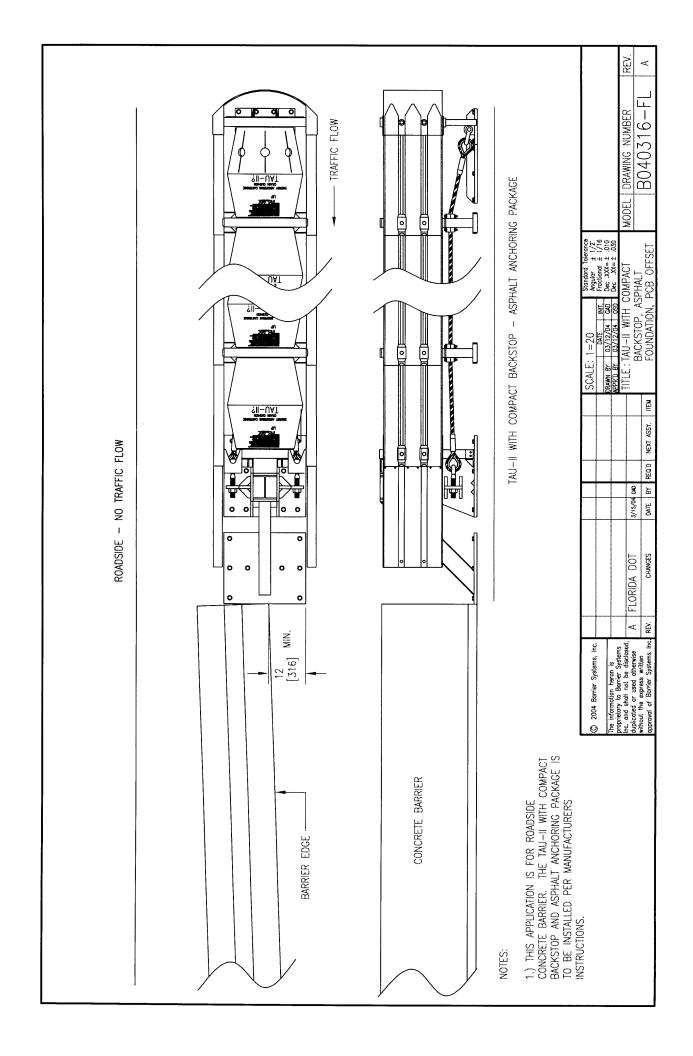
is not to be used for units installed after the date of this memo. Temporary Tau II units using a Compact Backstop with the Asphalt Backstop Assembly on an asphalt foundation installed after the date of this memo shall use only Drawing No. B040301 described below or subsequent approved drawings on the QPL.
